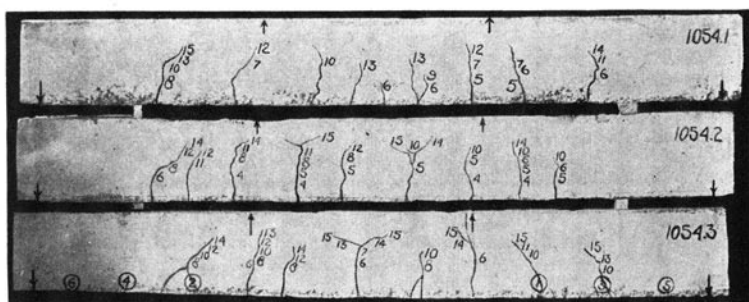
REINFORCED CONCRETE BEAMS AFTER TEST—1912 SERIES.
